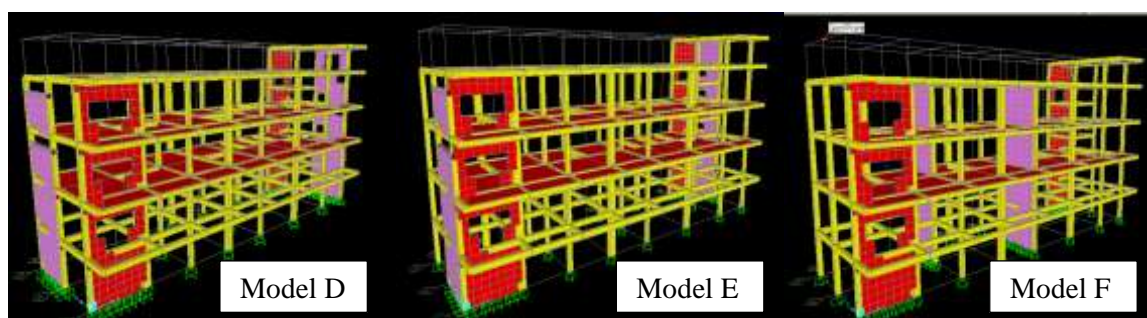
3D Modelling of Retrofitted Buildings (with openings)
